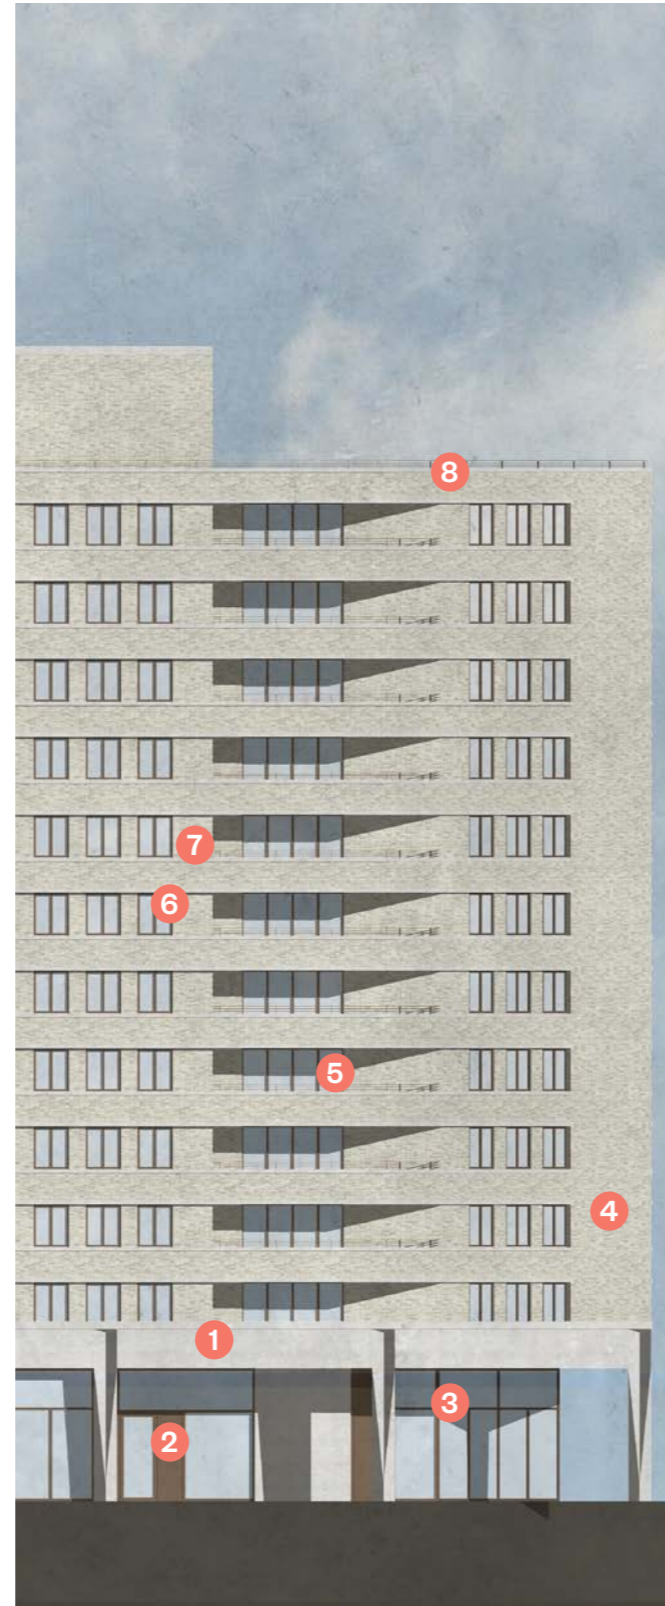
Partial east elevation of Building C4 (Enterprise Yard)
